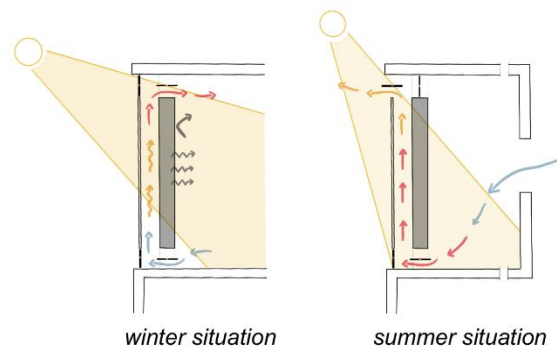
Summer & winter working of the Trombe wall. Author's work (2025)
